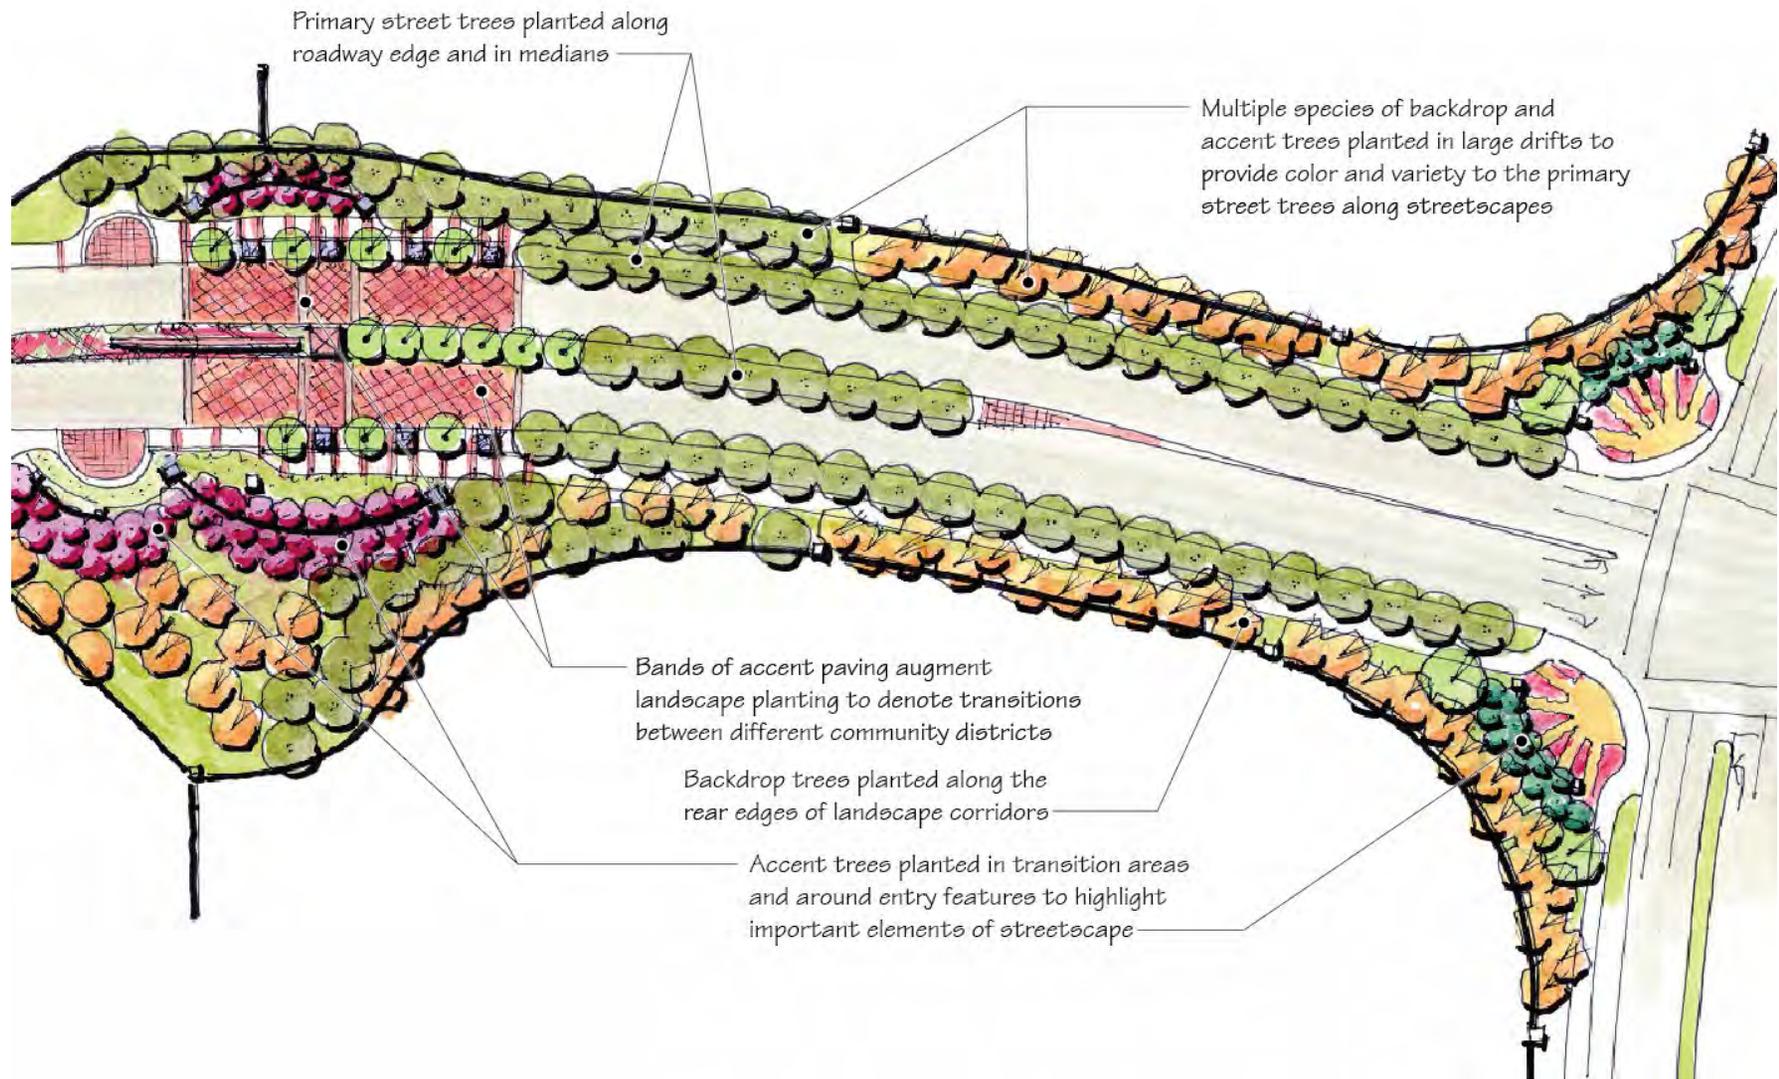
PLANTING CONCEPT FOR STREETSCAPES
